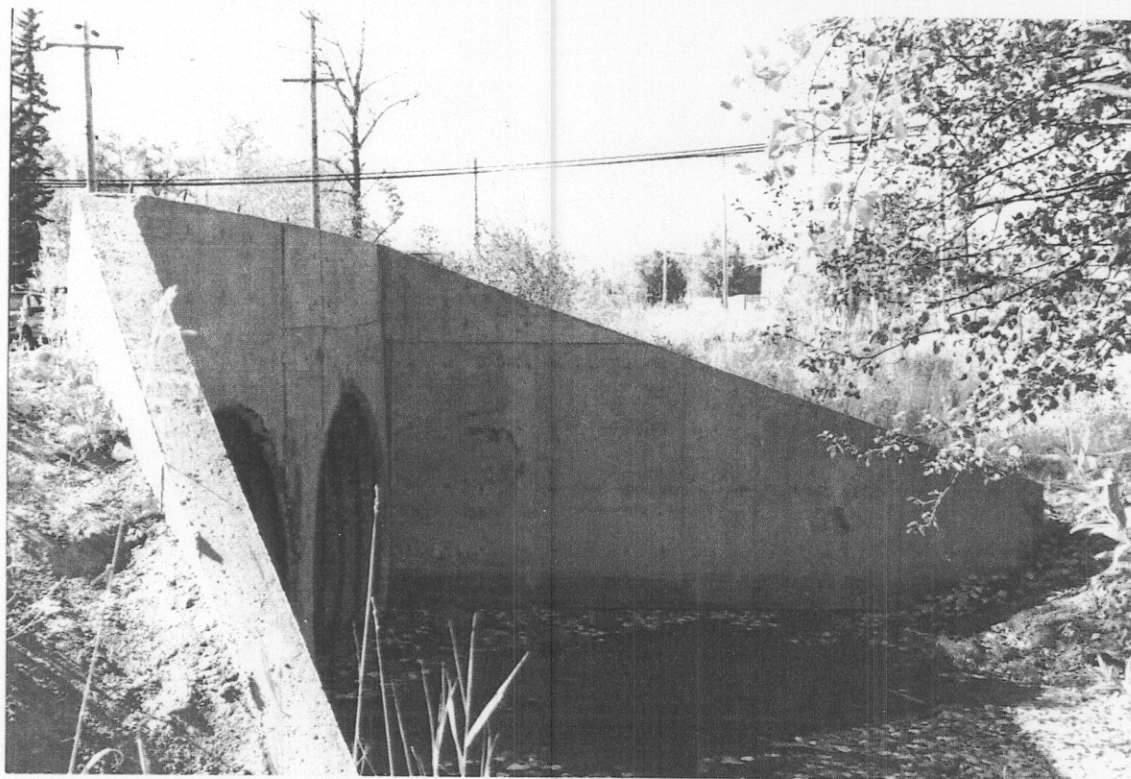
• NAHOUNLI CREEK AT ASH ROAD CULVERT ENTRANCE (SECTION 12)
